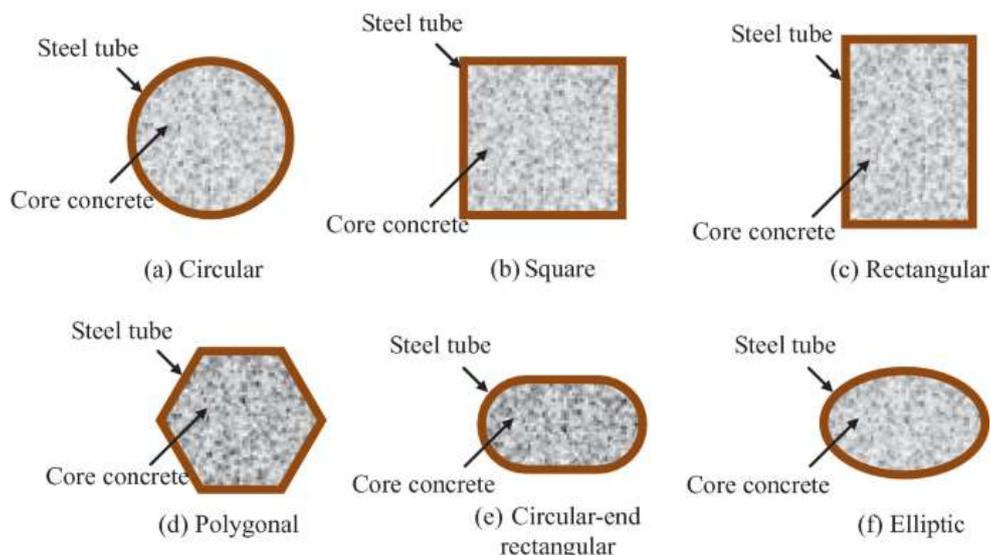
Concrete-Filled Steel Tubular (CFST) Members
